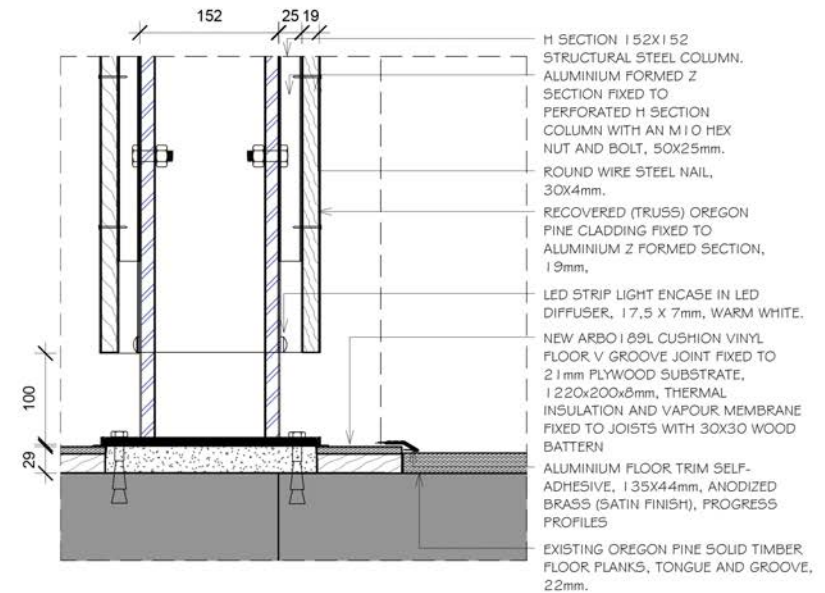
Section 3 column and floor finish, not to scale (Author 2018)
